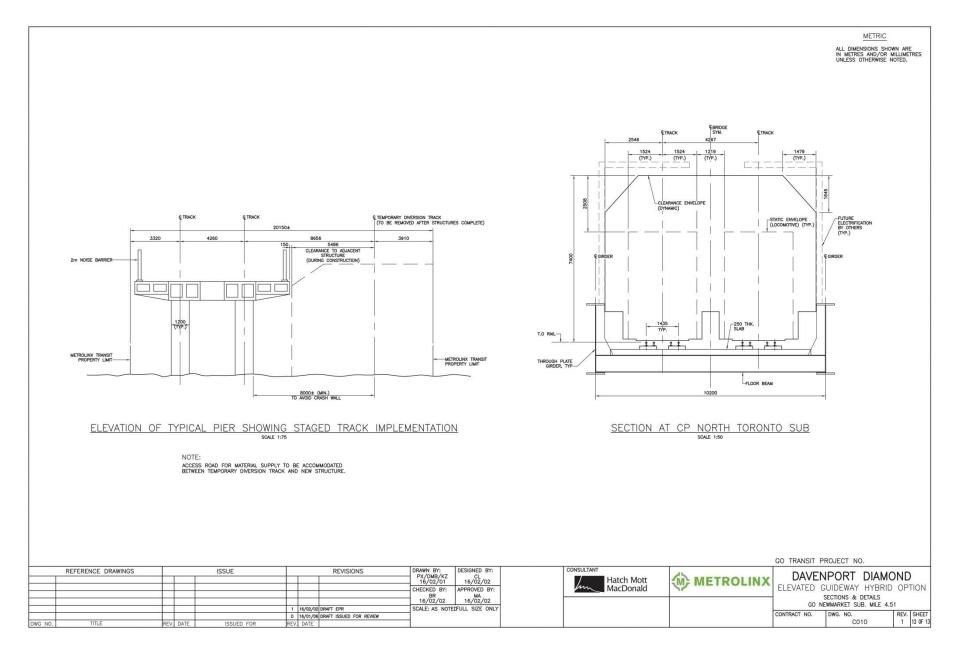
Typical Cross Section – Pier Showing Staged Track Implementation and CP North Toronto Subdivision
